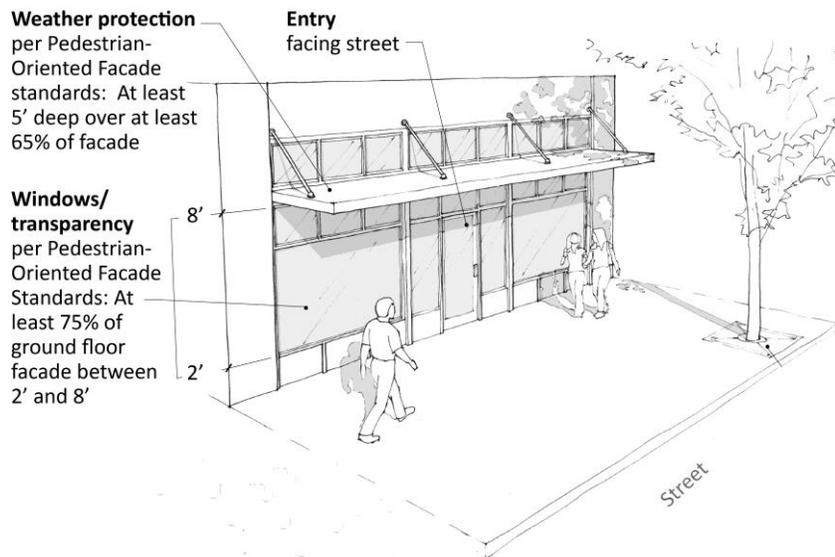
B.1. An example of a pedestrian oriented façade.
